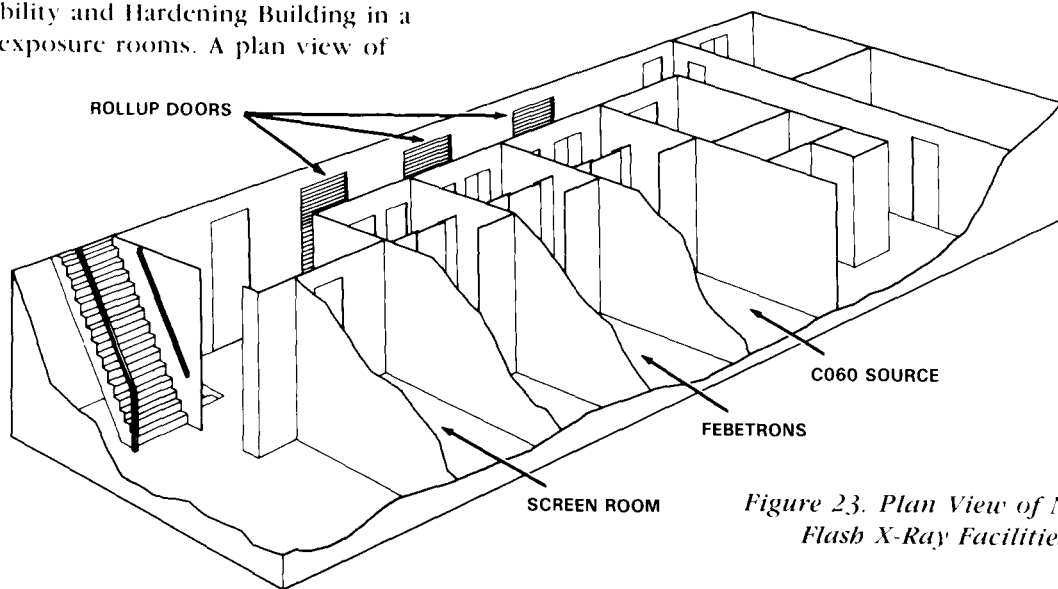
Plan View of NSW/C Flash X-Ray Facilities
